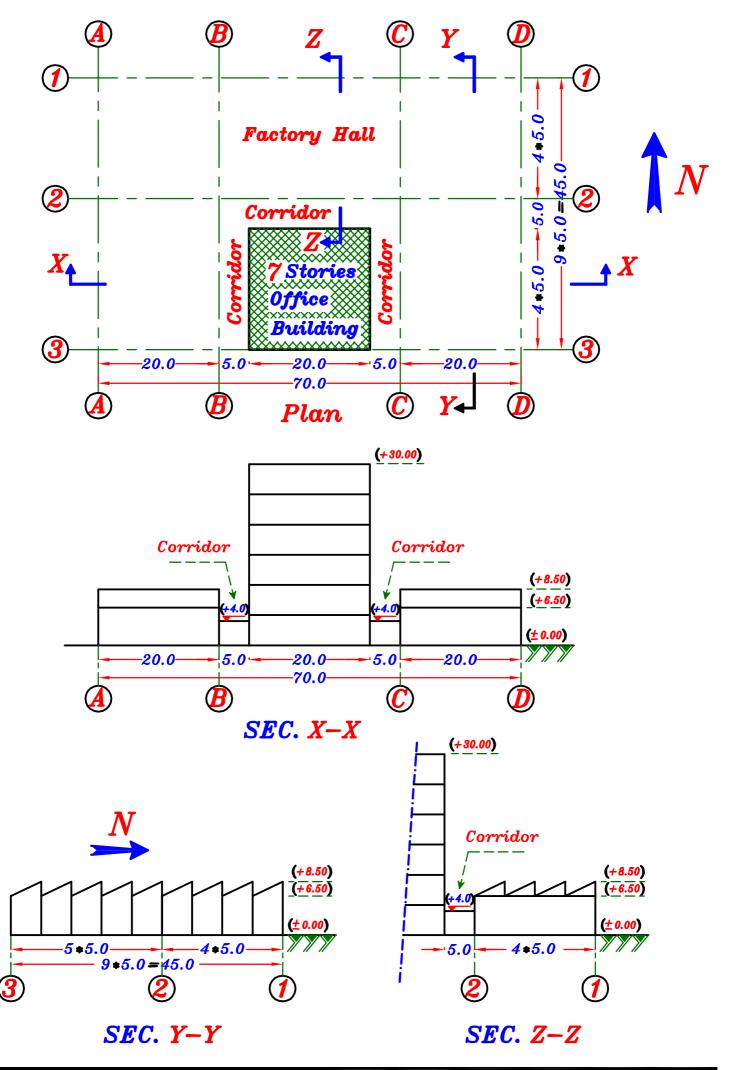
shows an U-shape Factory hall and its accompanied 7-stories office building. The Factory hall is covered with a north light saw-tooth roof R.C. structure. The corridor between the Factory hall and the office building is covered with Floating bay hollow block slab panel. Considering the given north direction and that the columns are only allowed along the axes A,B,C,D,1,3 & 2/B-C each 5.0 m.
